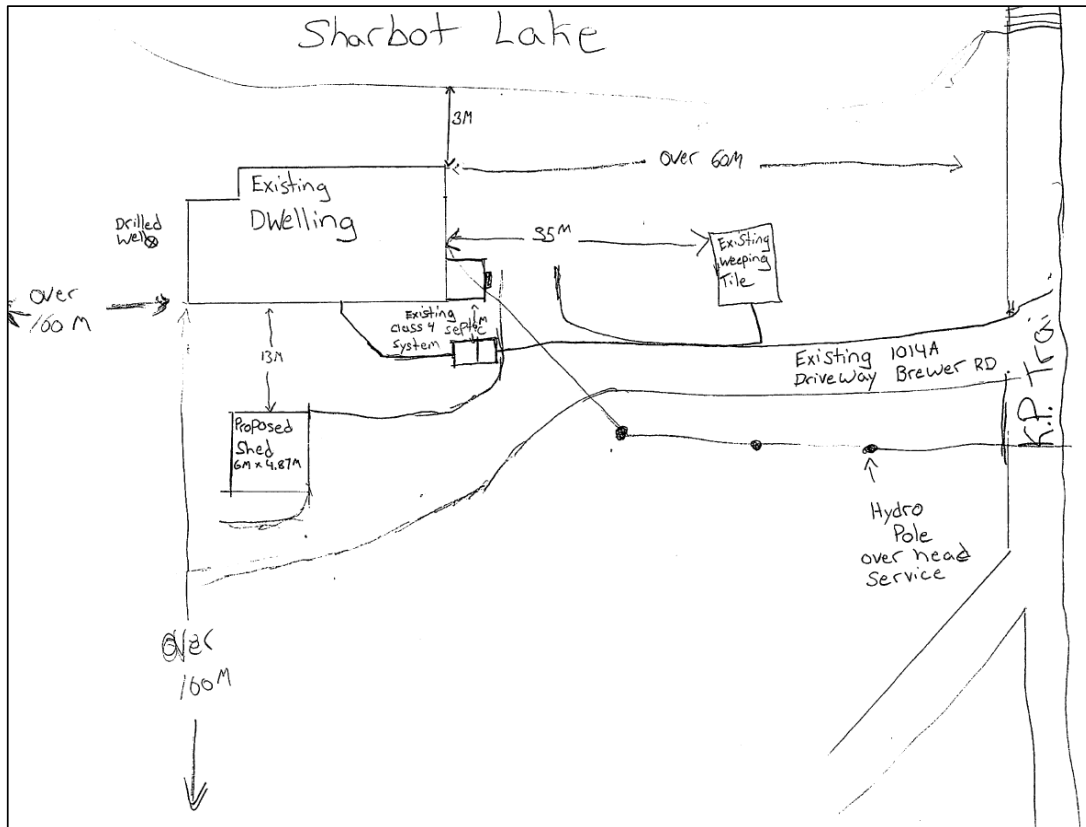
Sketch submitted with the application showing the existing dwelling and the proposed storage shed.
